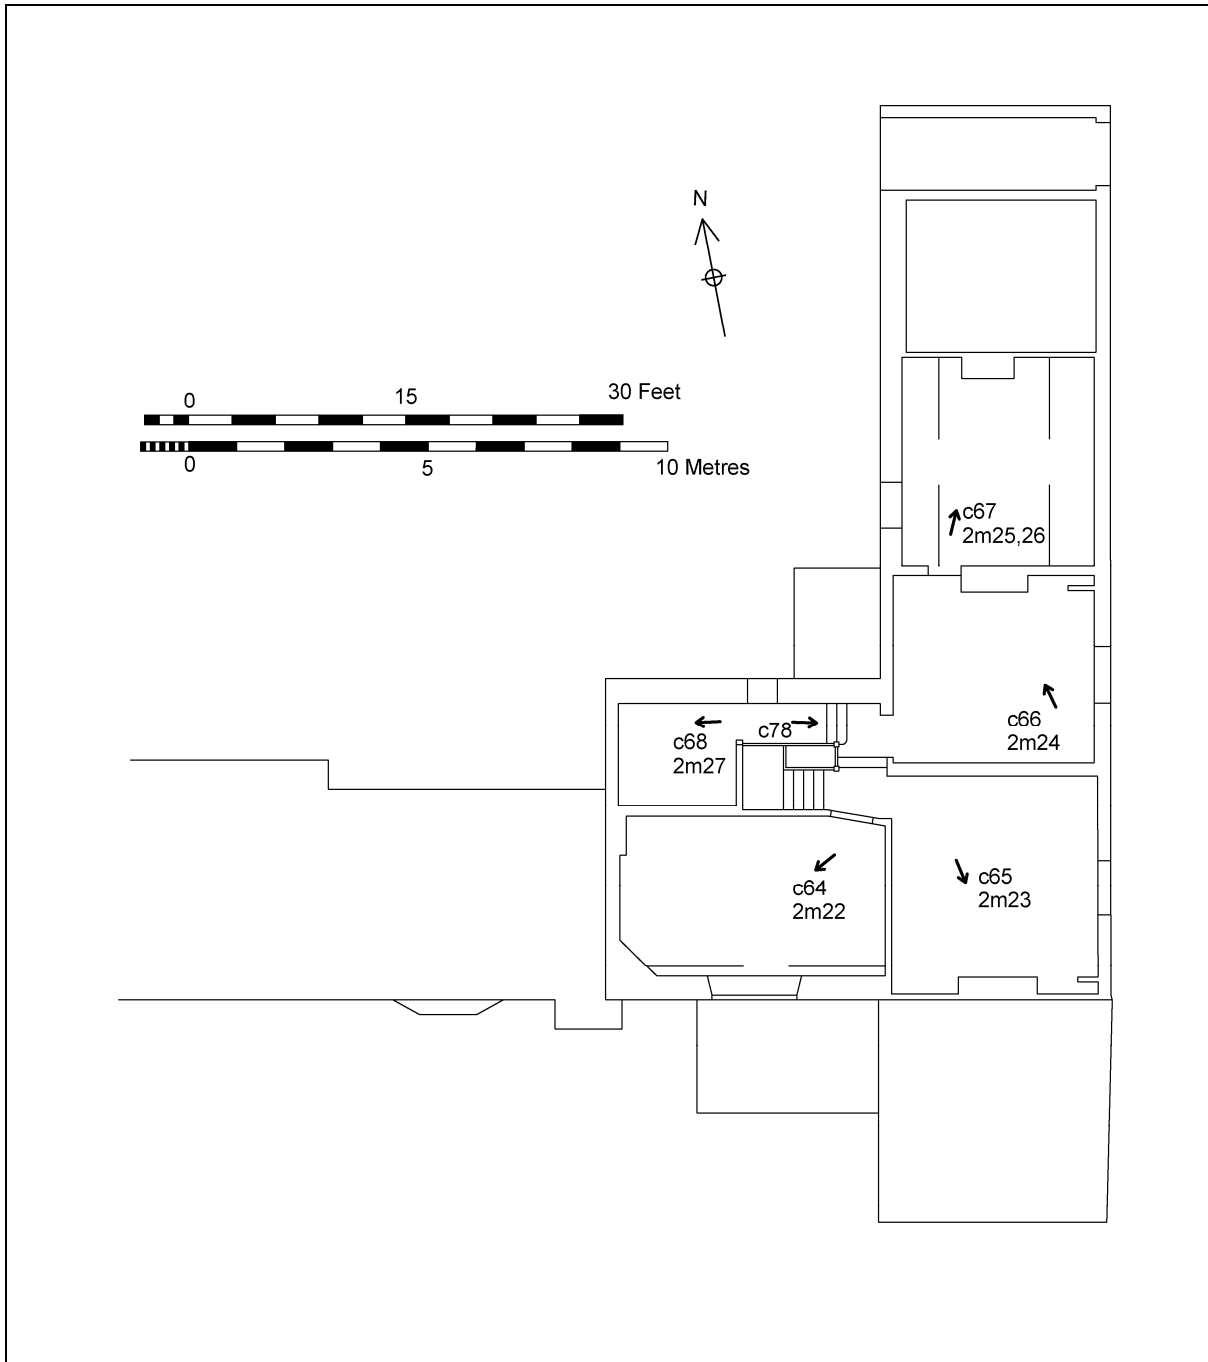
Farmhouse, first floor, with location of archived photographs added.
